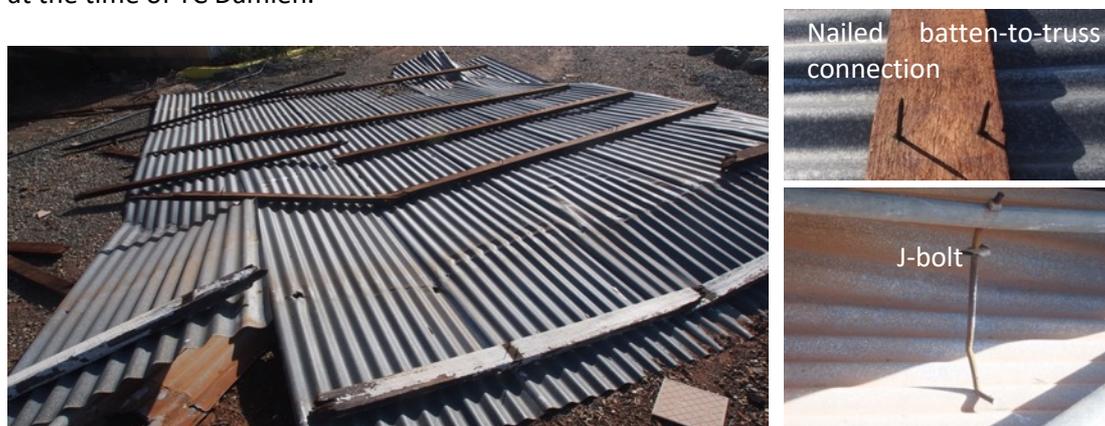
Loss of roof sheeting and battens at batten-to-truss nailed connections
